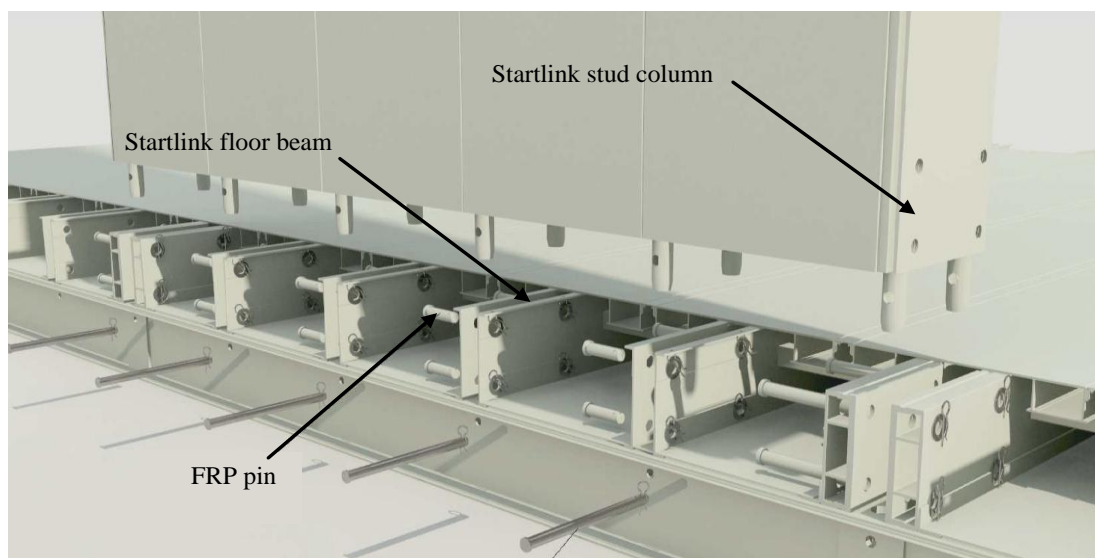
Joint holes and FRP dowels at ground floor level.
